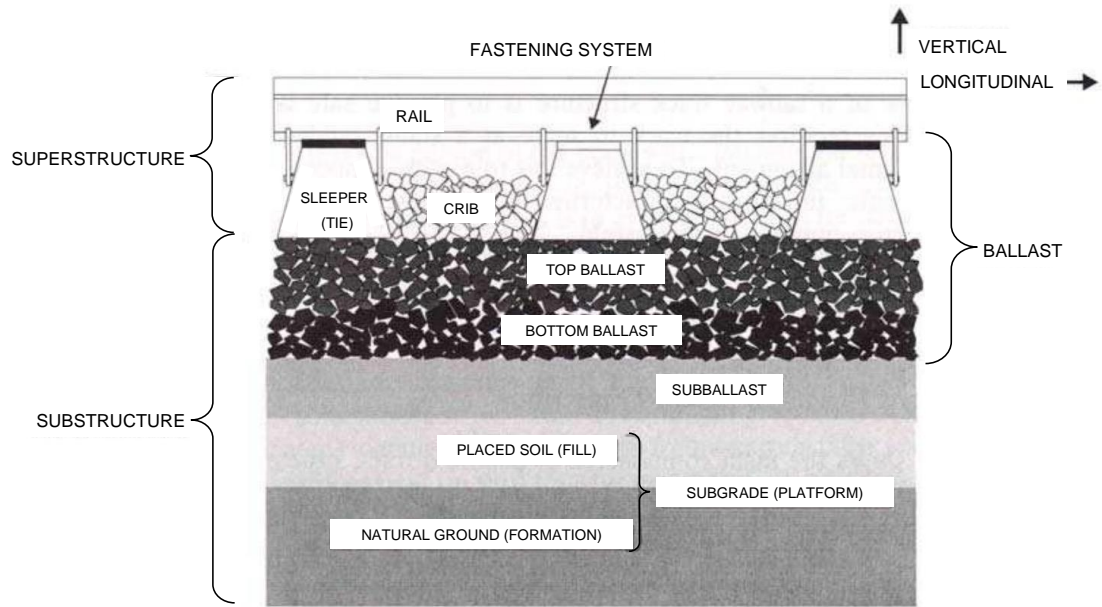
Longitudinal view of the structural component of a typical ballasted track (Selig & Waters, 1994).
